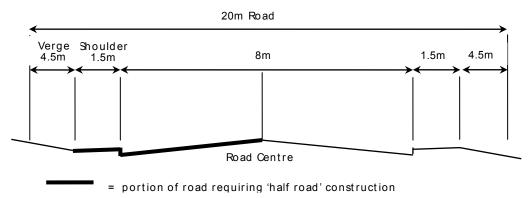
Half Road Construction for Subdivision in the R2 zone
